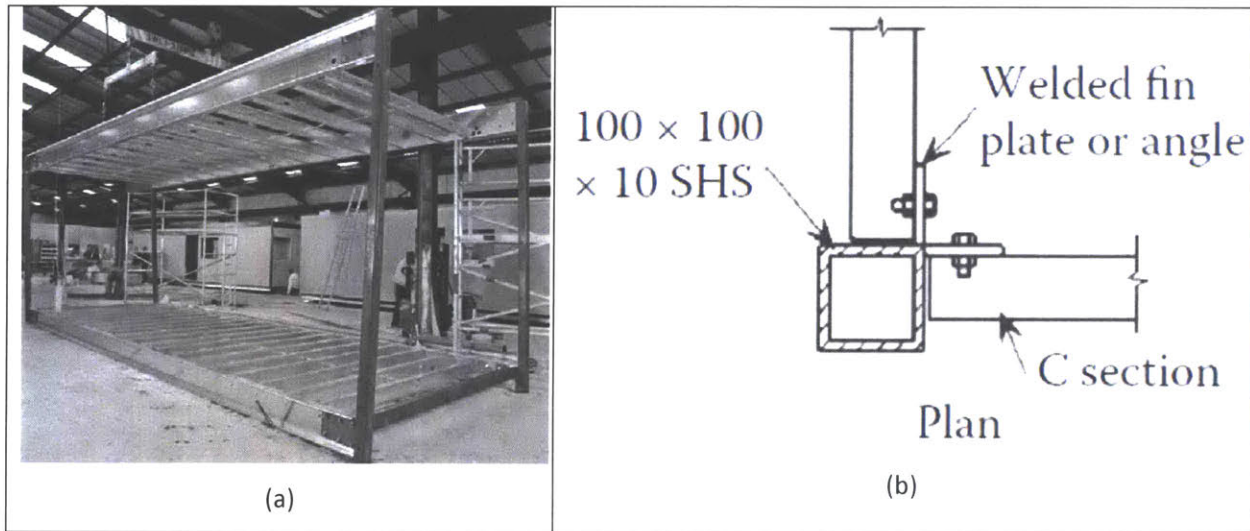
BOLTED MODULAR CONNECTION. (A) ISOMETRIC VIEW (B), PLAN VIEW (LAWSON ET AL. 2014)
